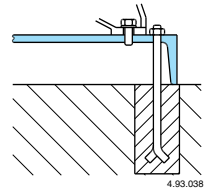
Foundation for unit mounted on single-piece, channel-steel baseplate.
